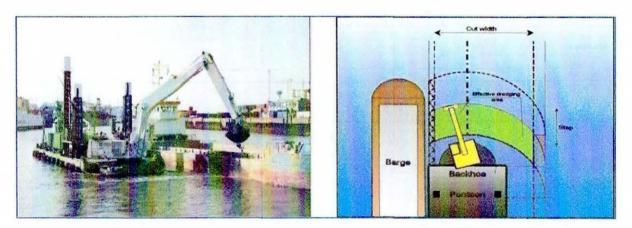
Typical Sub-Sea Pipeline Equipment - Backhoe Dredger
